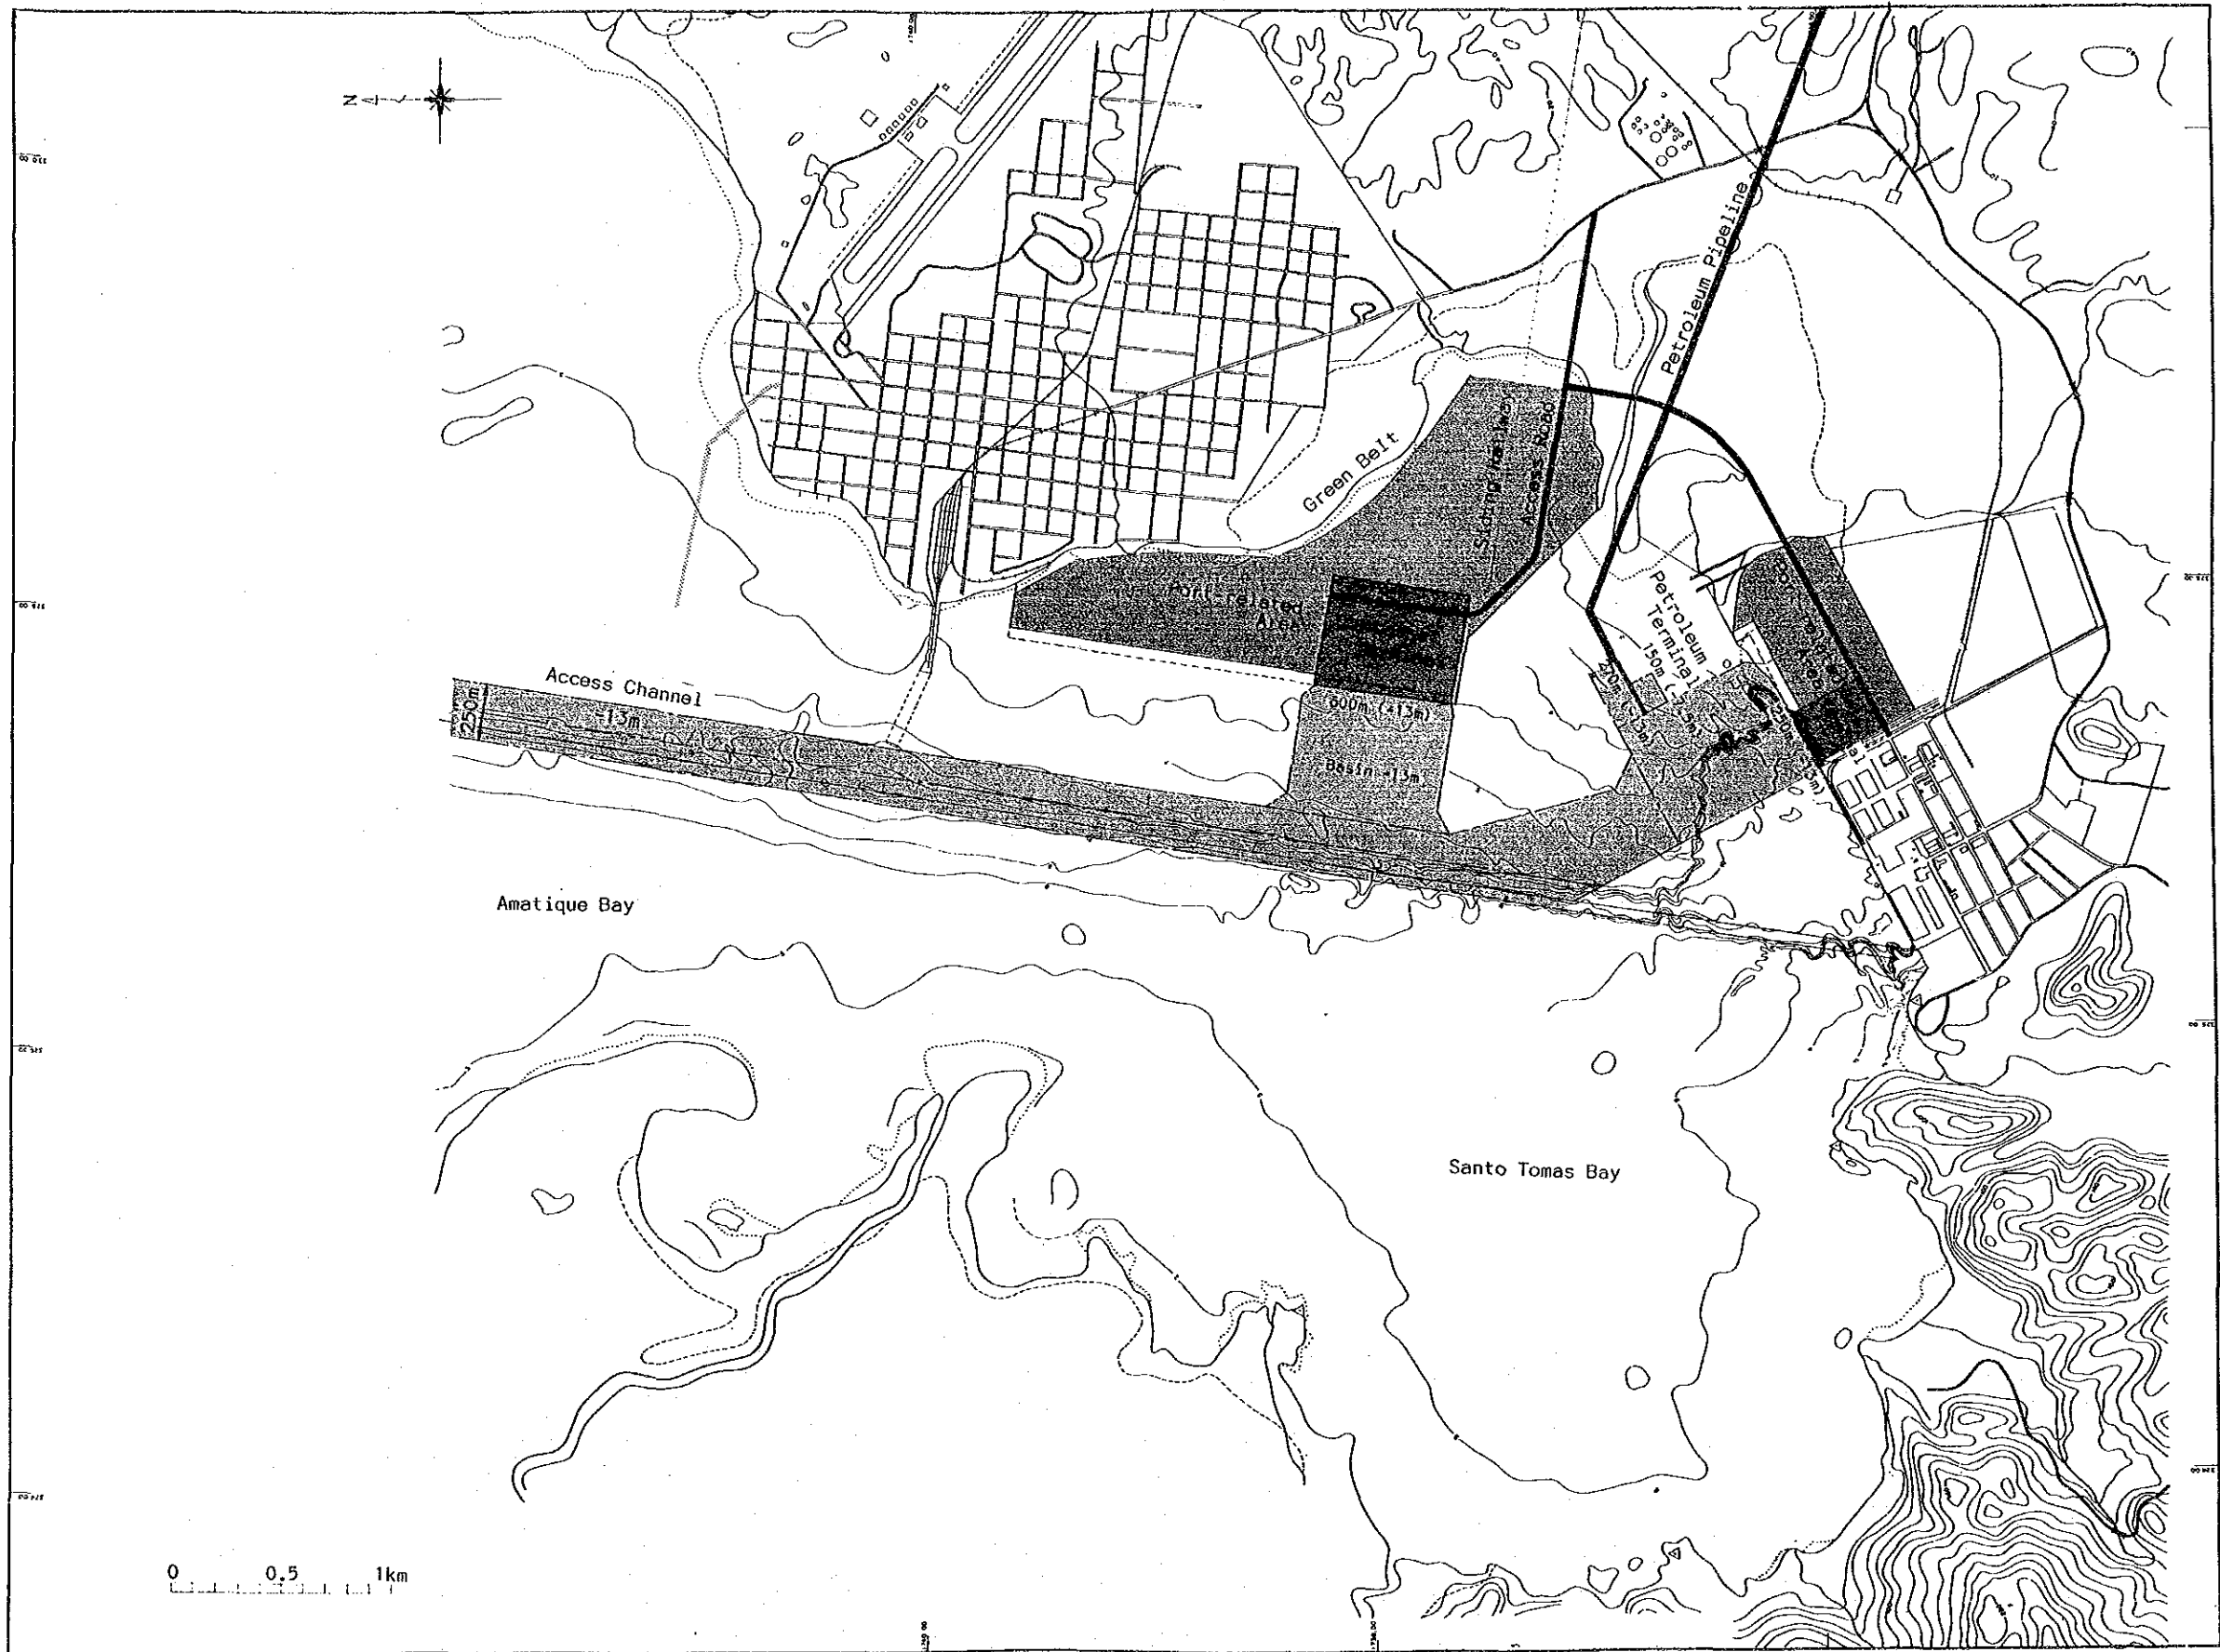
Alternative Layout Plan -- Case 2
